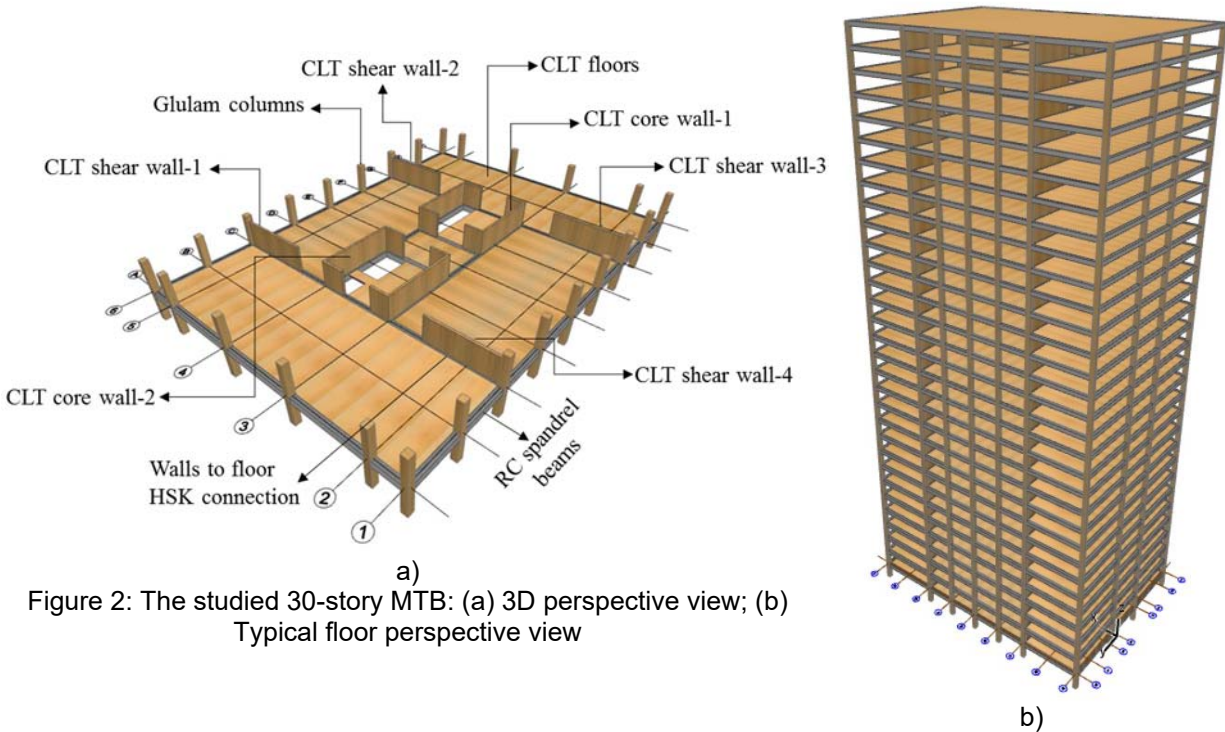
The studied 30-story MTB: (a) 3D perspective view; (b) Typical floor perspective view
